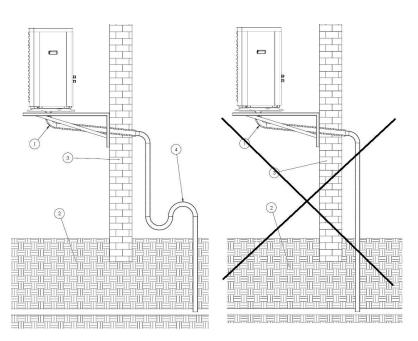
Connecting the condensate pipe inside the building 1 - Insulated condensate drain pipe; 2 - ground; 3 - wall; 4 - siphon
